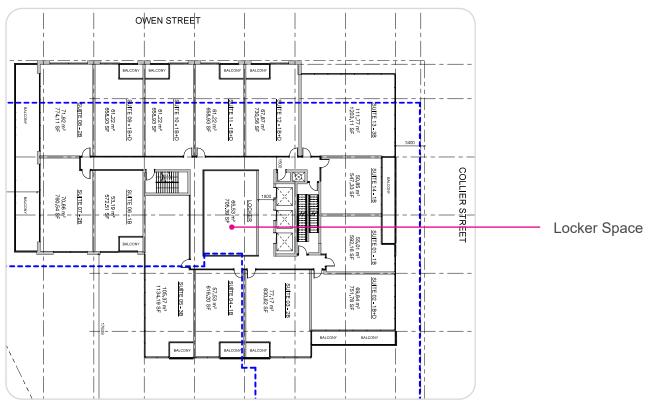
Level 6 Floor Plan, prepared by Scott Shields Architects Inc.
